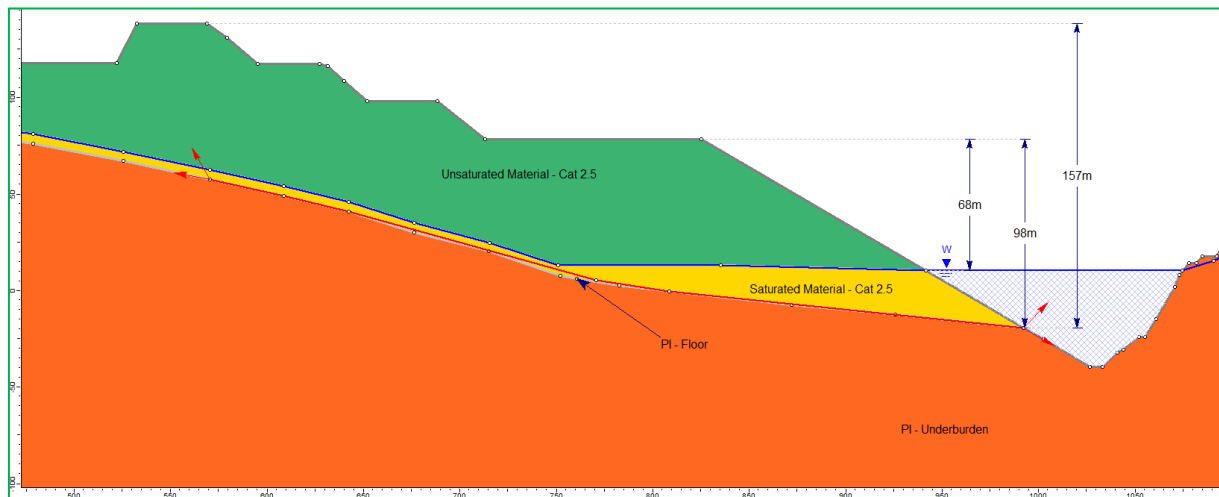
Schematic showing typical slope geometry for the Northern Highwall
